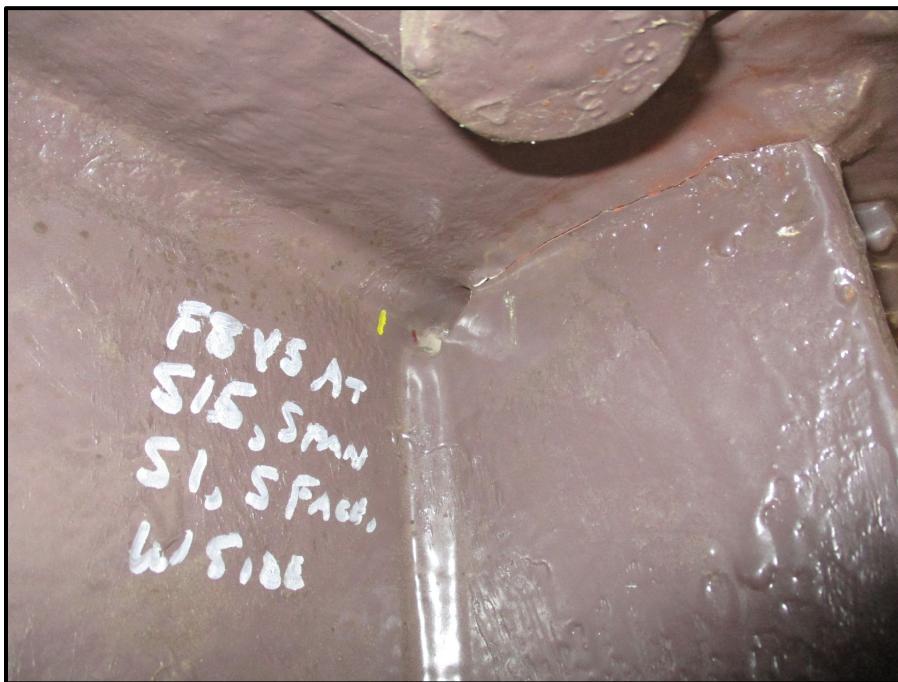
Span S1, Floorbeam 4S at Stringer 15S - Previously noted distressed paint along the lower toe of the web-to-upper flange weld on the south face of the floorbeam has developed into a 2-3/8'L crack with extended distressed paint, looking northeast. Note the completely severed stiffener top weld (previously noted condition).
